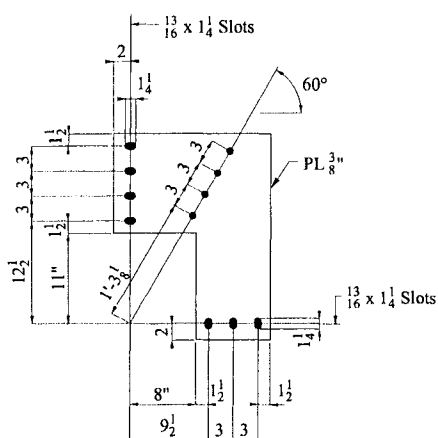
Horizontal brace connection at beam-to-column intersection.
